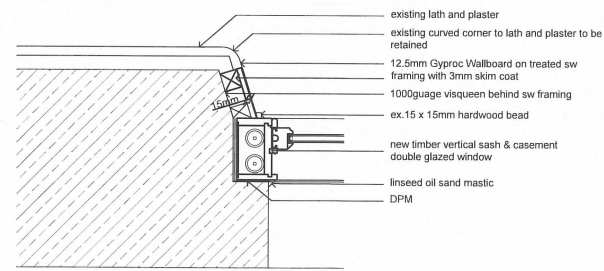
Section Through Typical Window (9 over 9) 1:20
